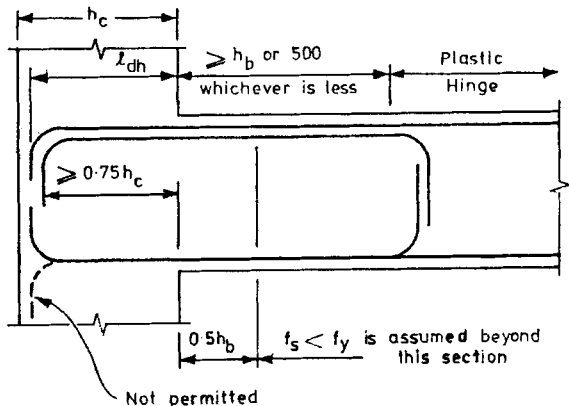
Anchorage of Beam Bars When Critical Section of Plastic Hinge is Located at Sufficient Distance From Column Face [5].
